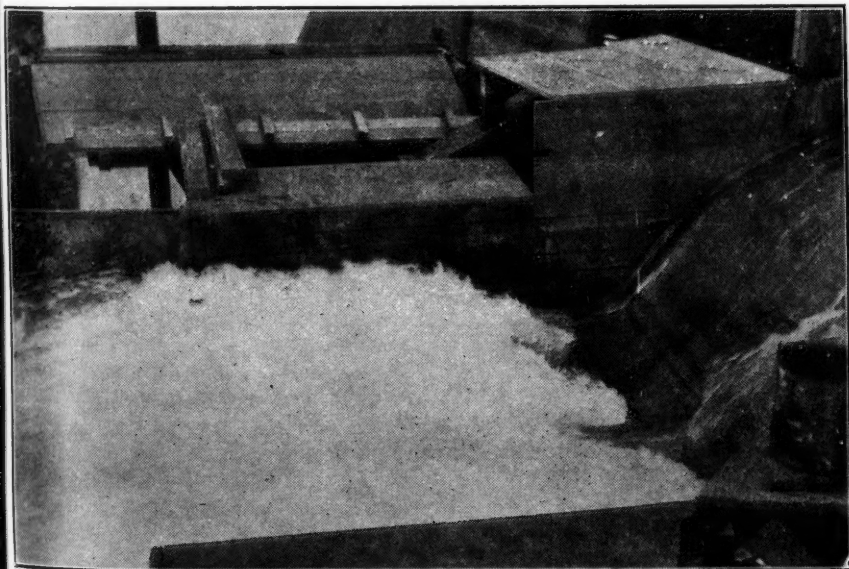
PIT NO. 4 TEST DAM: EXPERIMENT NO. 32. CURVED BAFFLE-PIERS WITH SPLITTER PIERS AND CURVED BAFFLE-PIERS. BACK-WATER CONTROL PROPORTIONAL TO 11 FEET 6 INCHES ON ACTUAL DAM.
